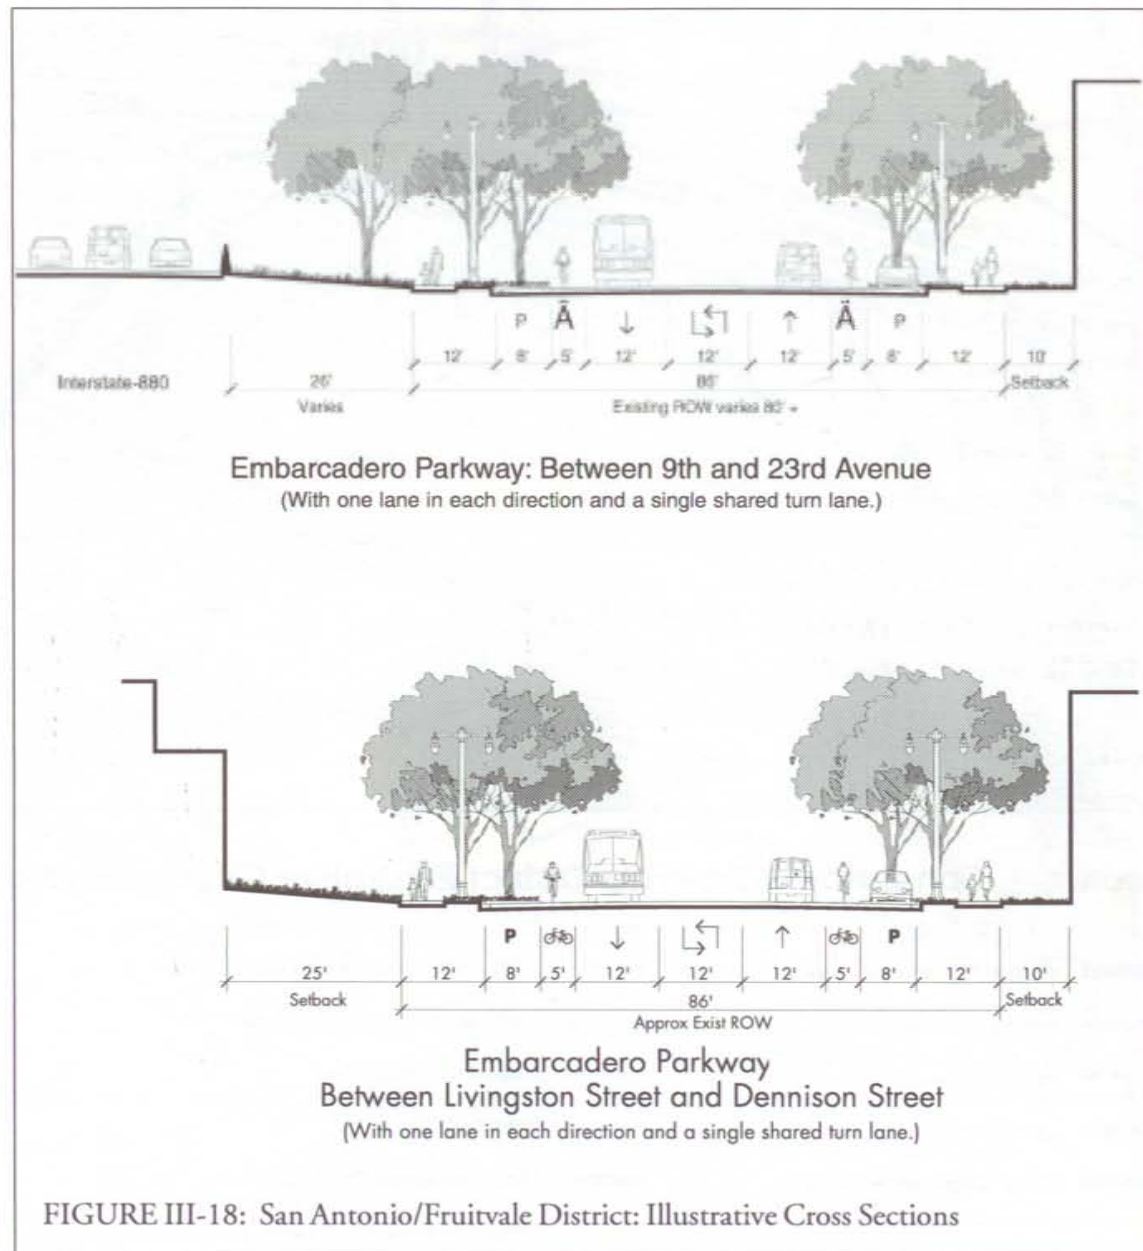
San Antonio/Fruitvale District: Illustrative Cross Sections
